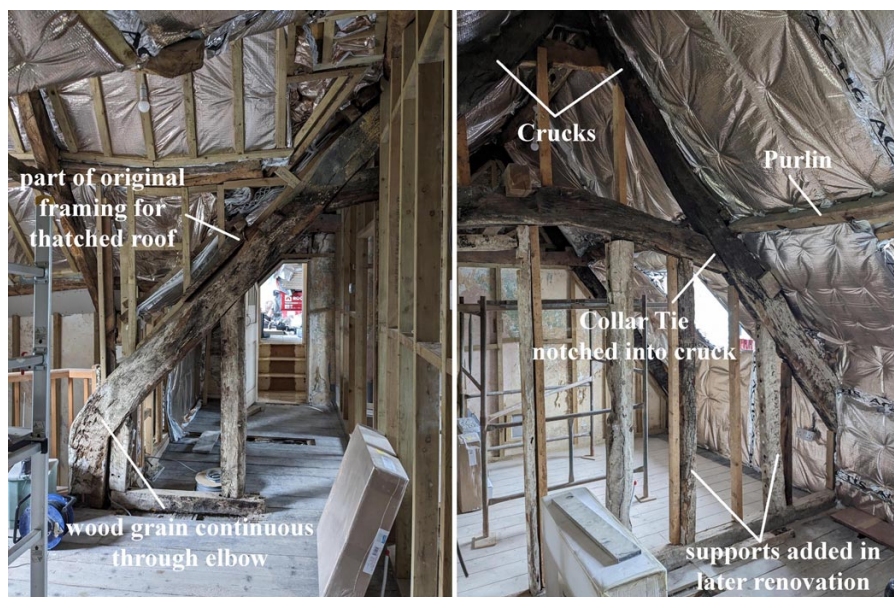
cruck timber framing used in the original house; continuous wood grain shown through elbows in timbers: left - showing elbow in cruck; right - showing cruck collar tie, purlins and later vertical support posts.
